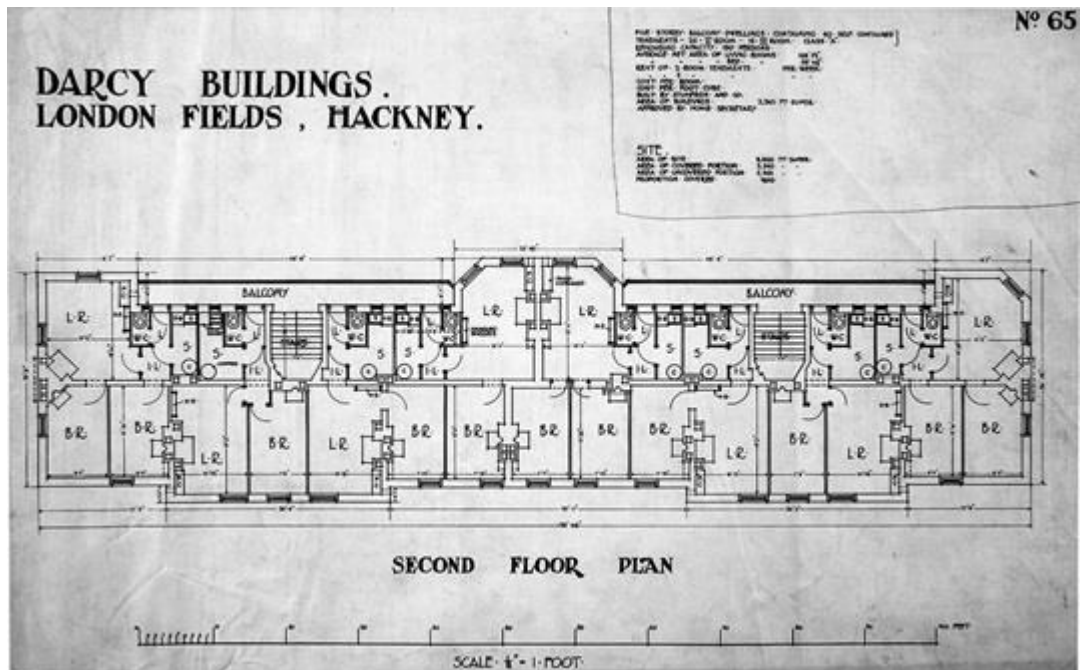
Darcy Buildings floor plan (LMA ref: LCC/AR/HS/03/059)
